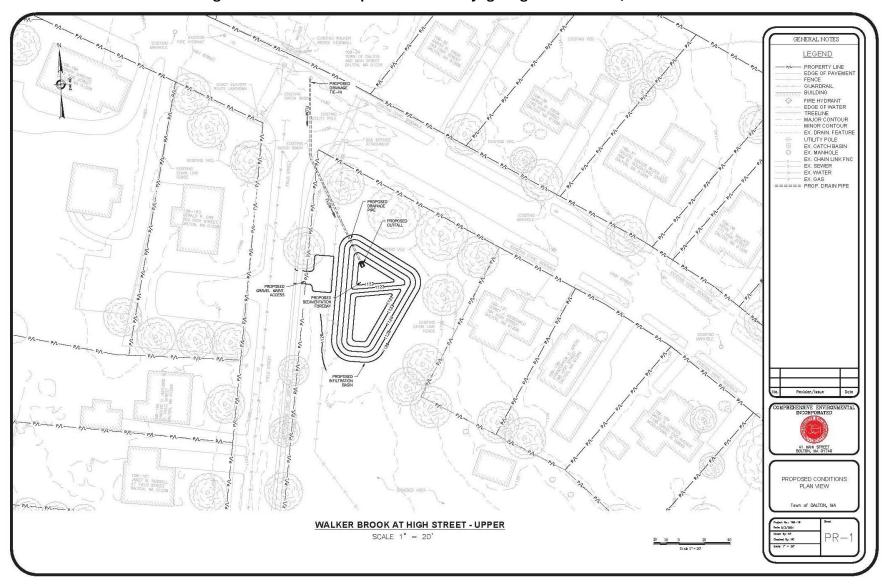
BMP Conceptual Plan for Daylighting Walker Brook, Dalton
